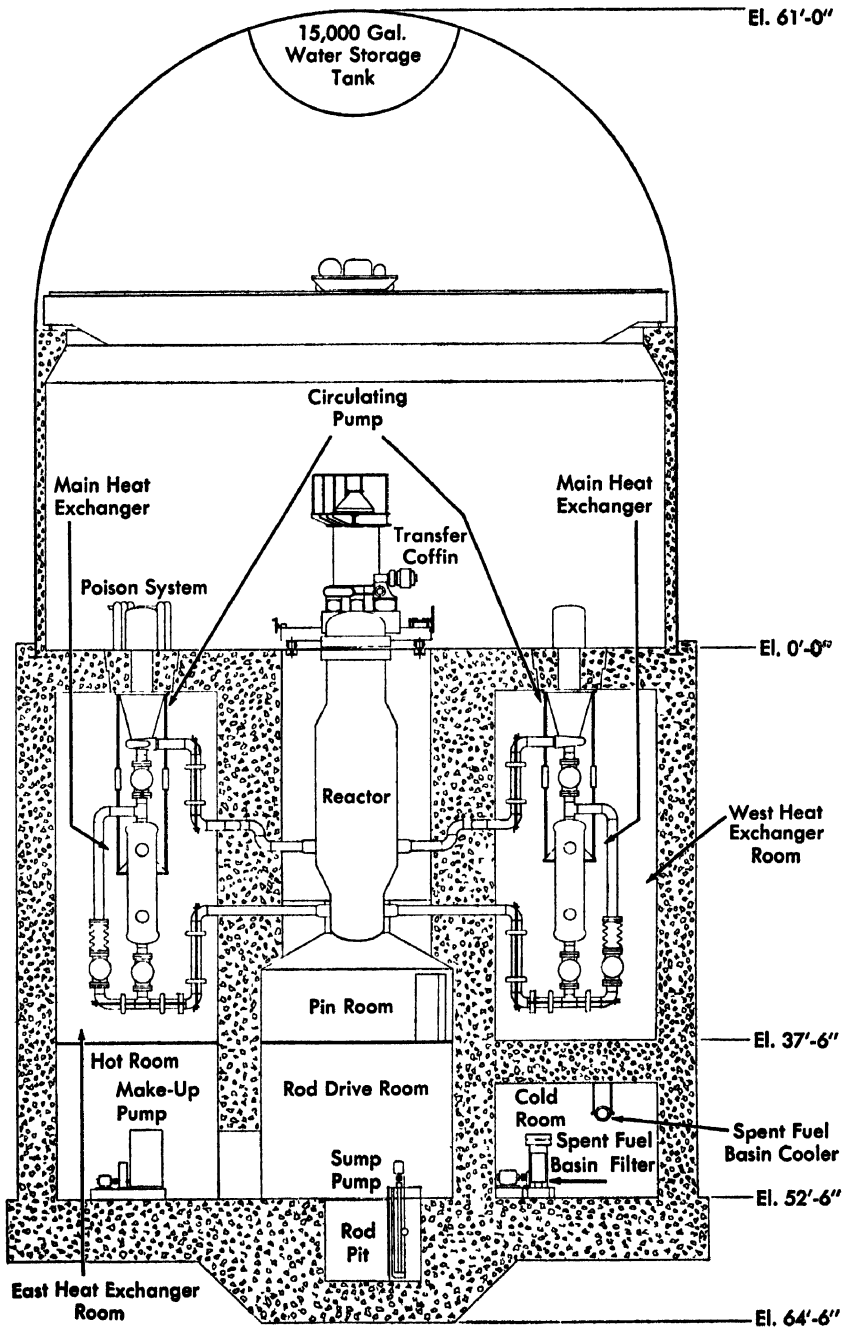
HWCTR containment building, showing arrangement of power components.
